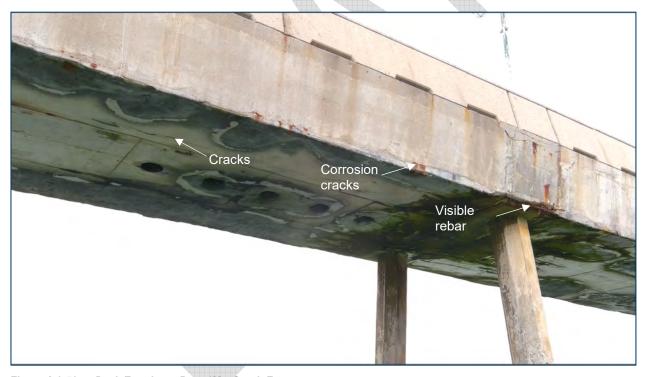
Deck Exterior at Bent 1M – South Face
